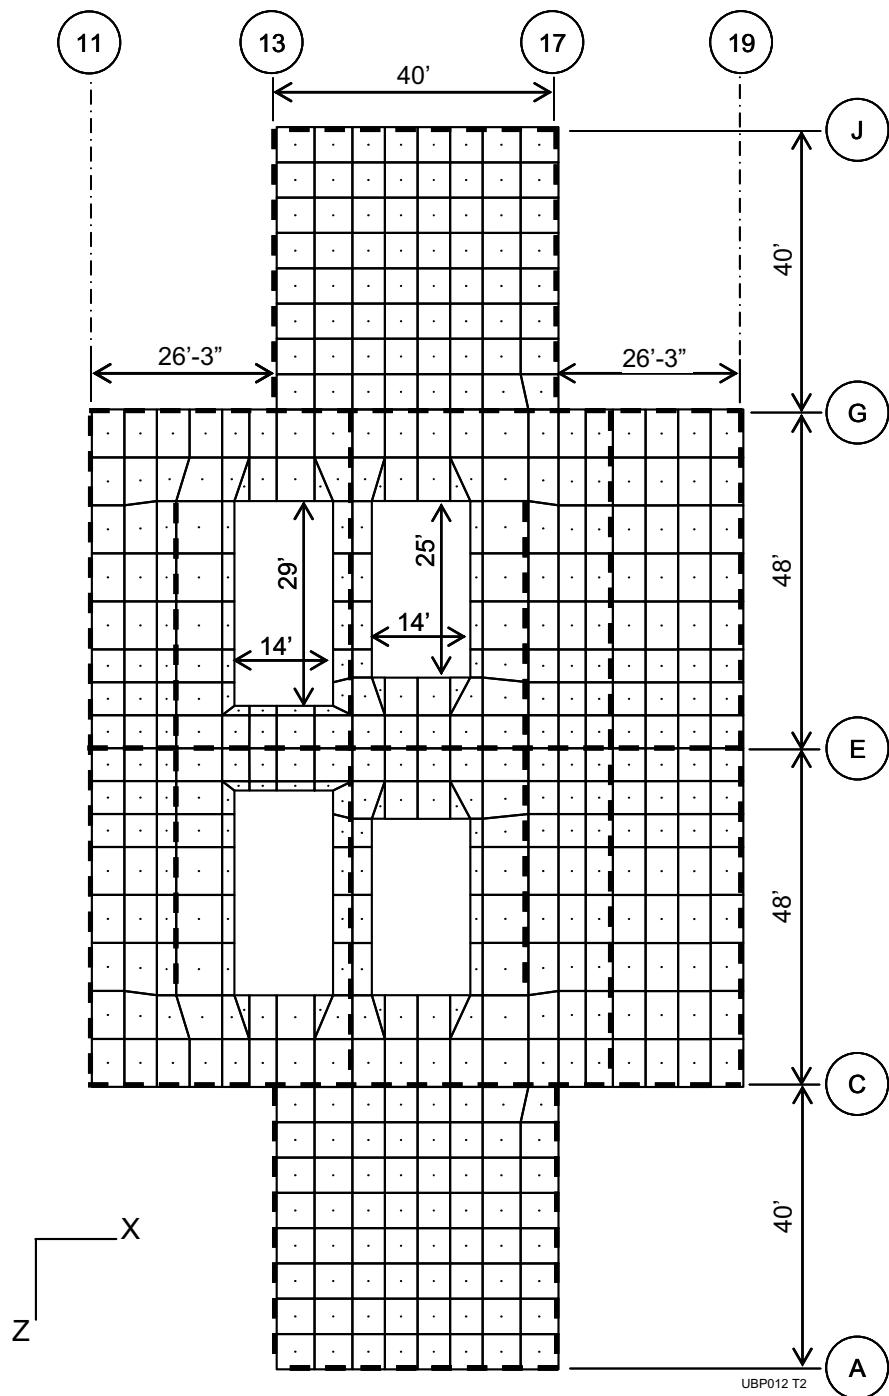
E.2-11—FEM View of EPGB Elevation 51'-6"
